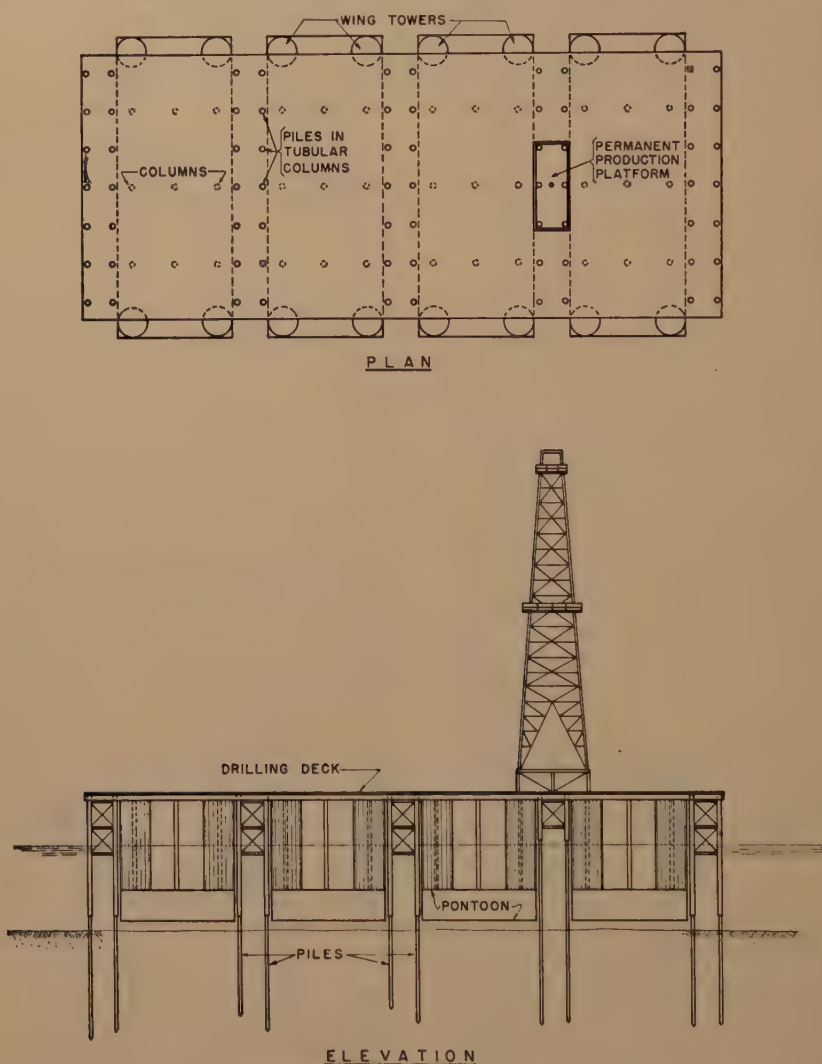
SCHEMATIC DRAWING OF A DRILLING PLATFORM.
